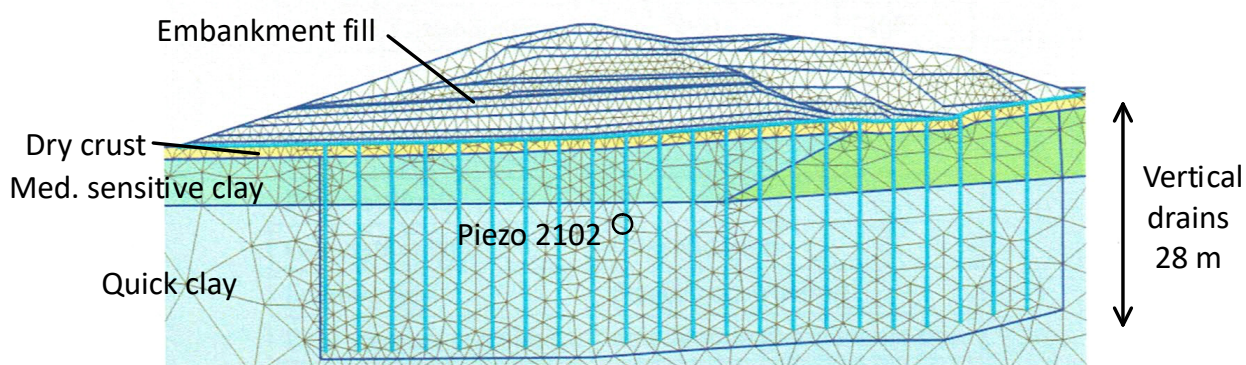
Cross section through embankment and finite element mesh. Image modified from [73].
